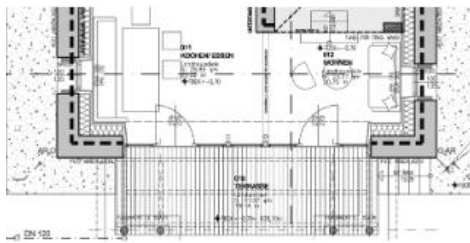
Floor plan of the south side of the ground floor, with internal insulation.
